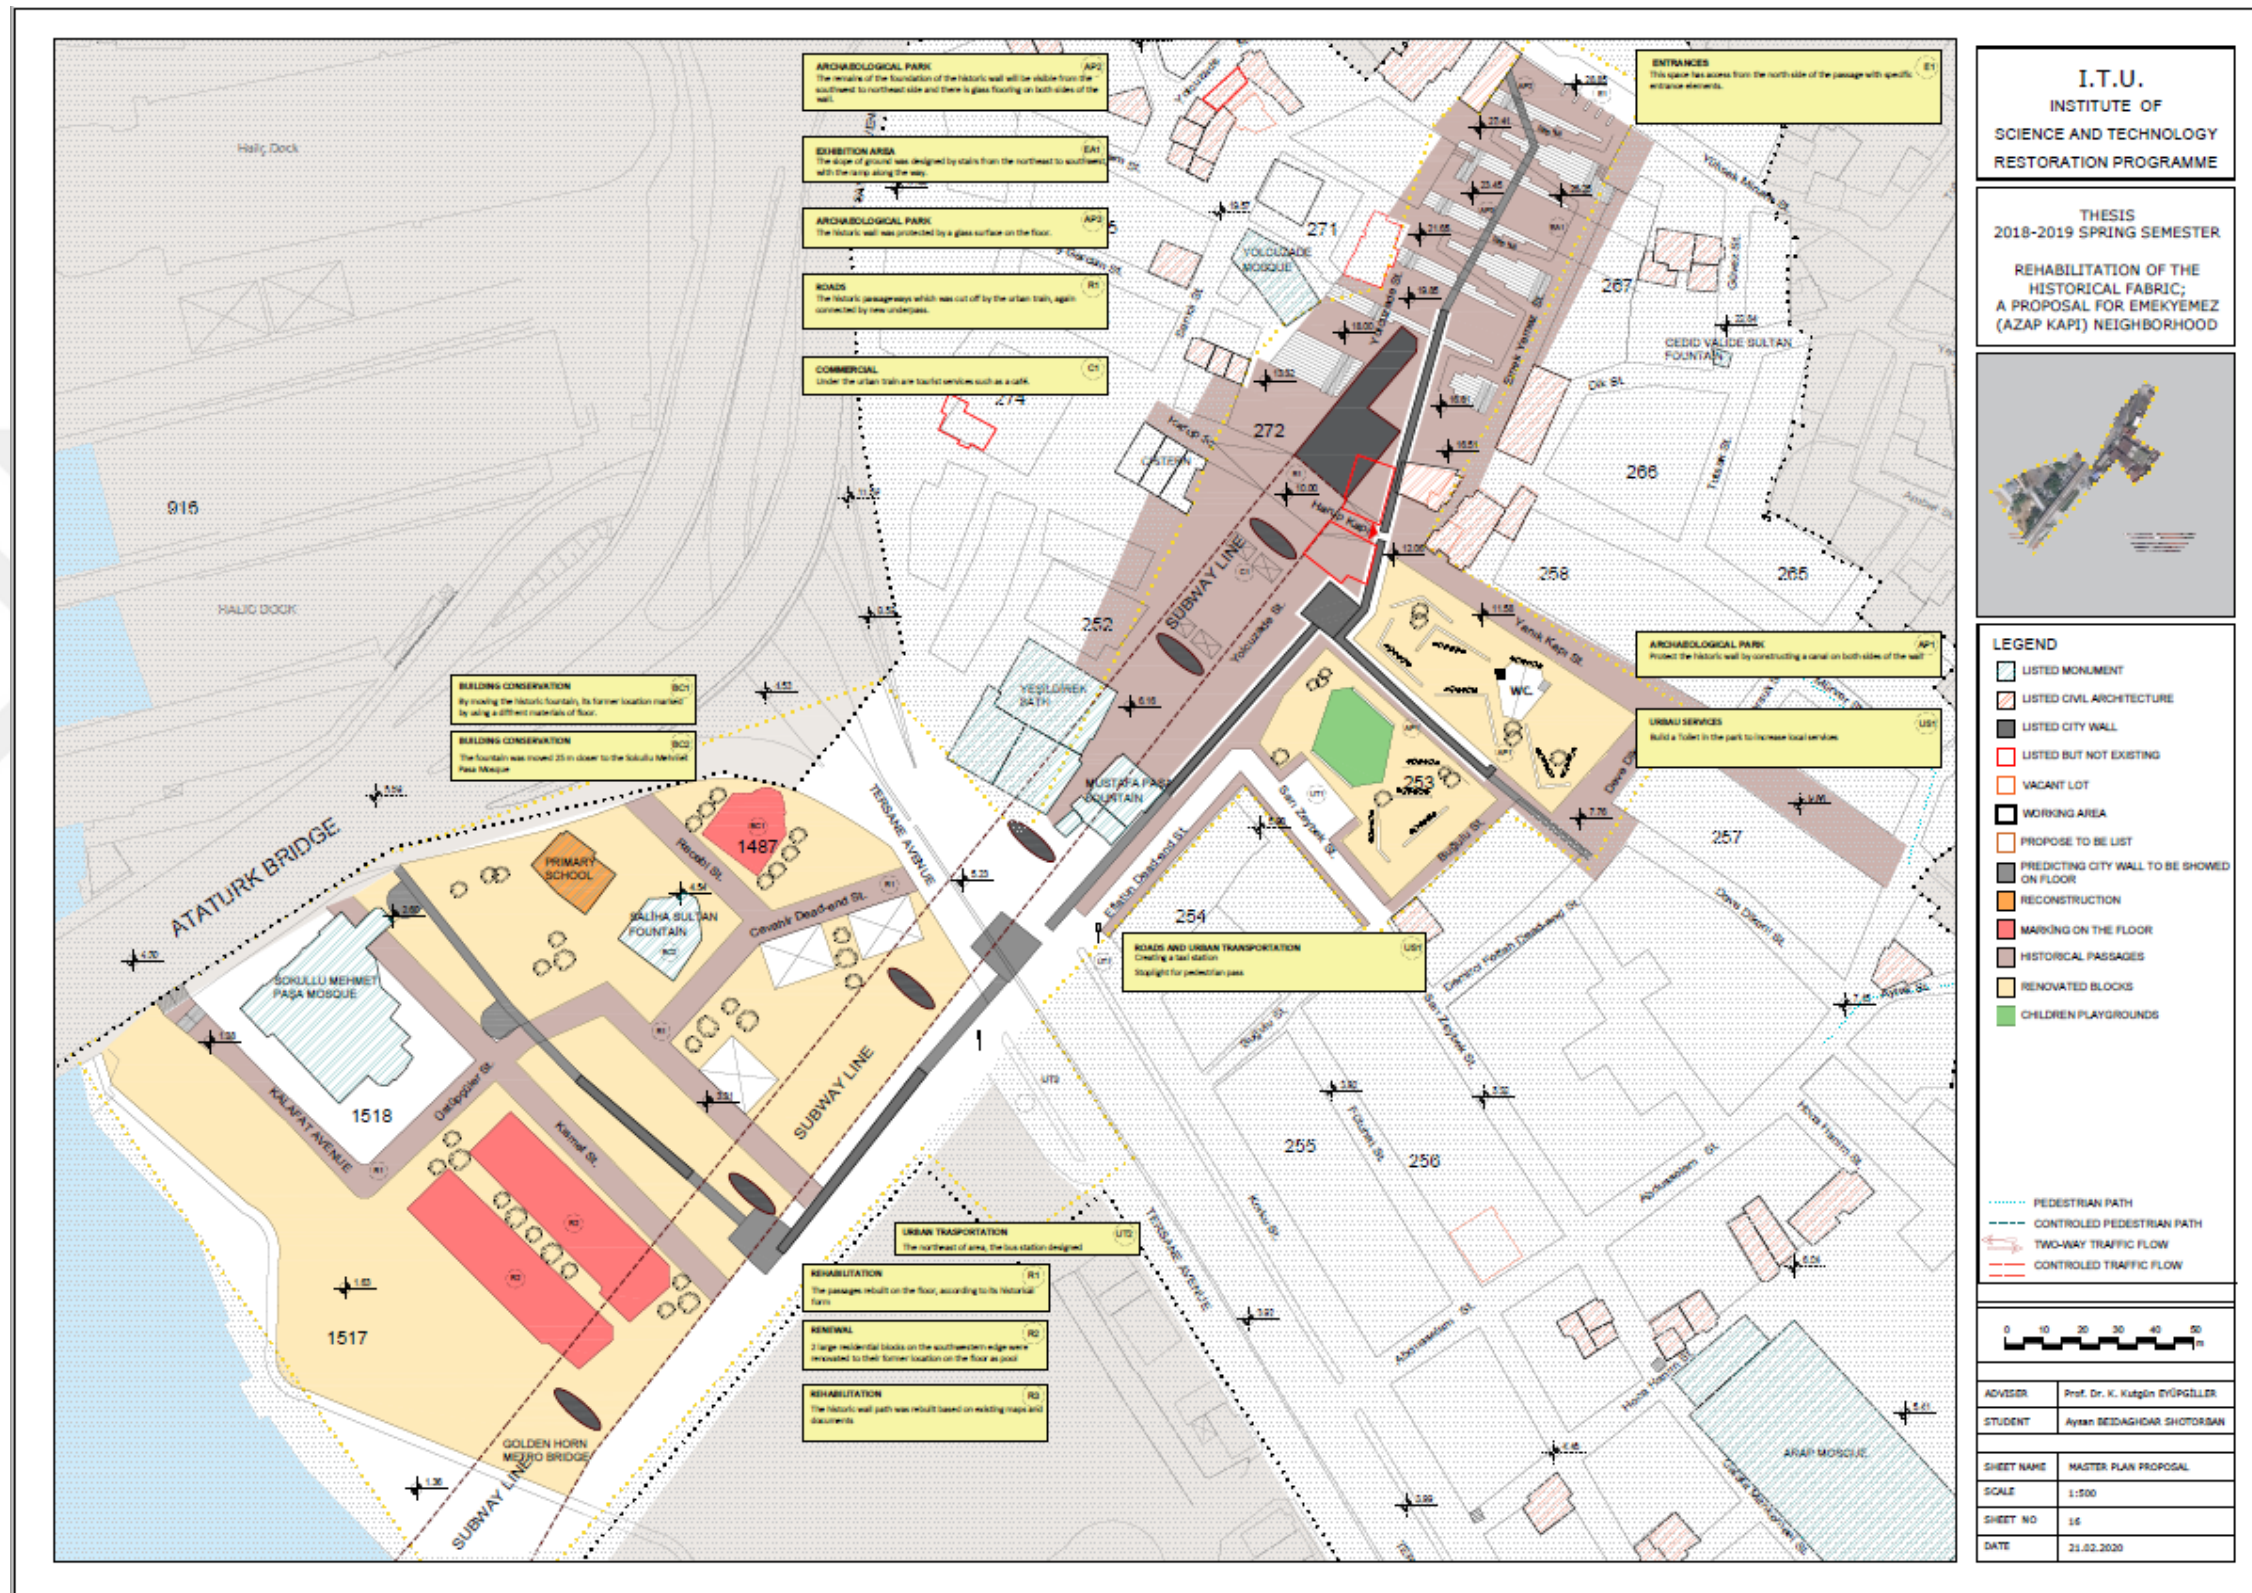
Emekyemez Neighborhood master plan 1/500 scale.
